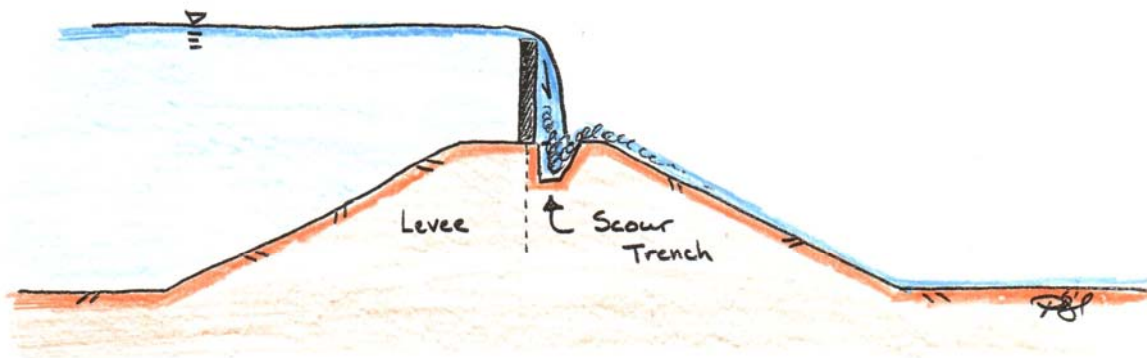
Jetting occurs when the water level on the outboard side of the levee exceeds the top of wall elevation for structural walls that are founded within the earthen levee. Unlike overtopping of a conventional earthen levee, the floodwall acts as a weir and water impacts the levee in a concentrated stream that is much more energy intensive than conventional overtopping.
